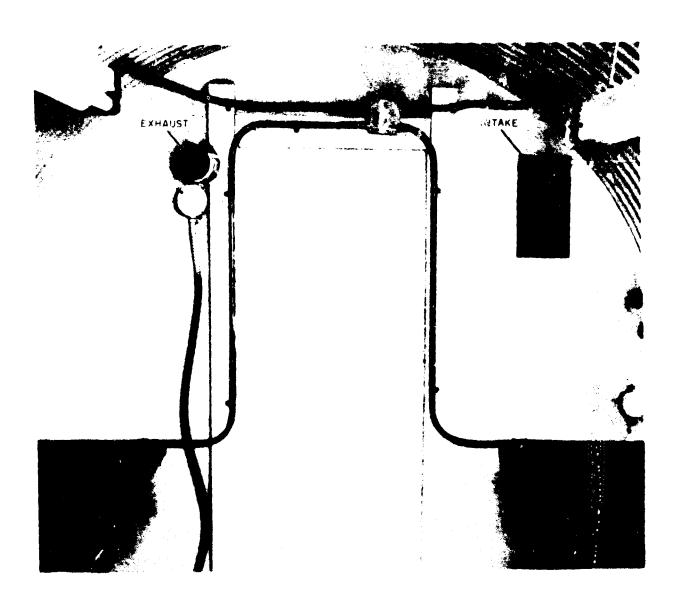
A View of Shelter Area Showing Access Door and Benches (look-ing Forward). The rectangular aperature on the right is the ventilation intake; the exhaust duct is to the left of the door.
